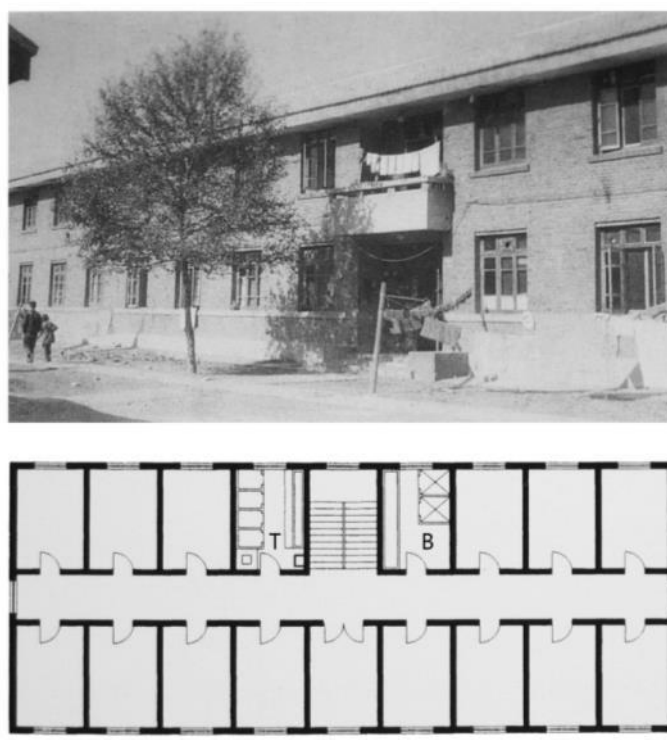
15 Plan Layout of a Typical Work Unit
